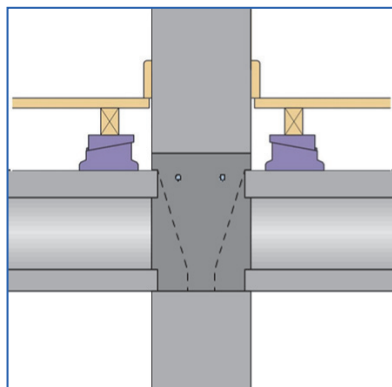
Example of Danish heavy wall / heavy floor construction for new apartment houses fulfilling the Danish Building Regulations 2010 [4].
